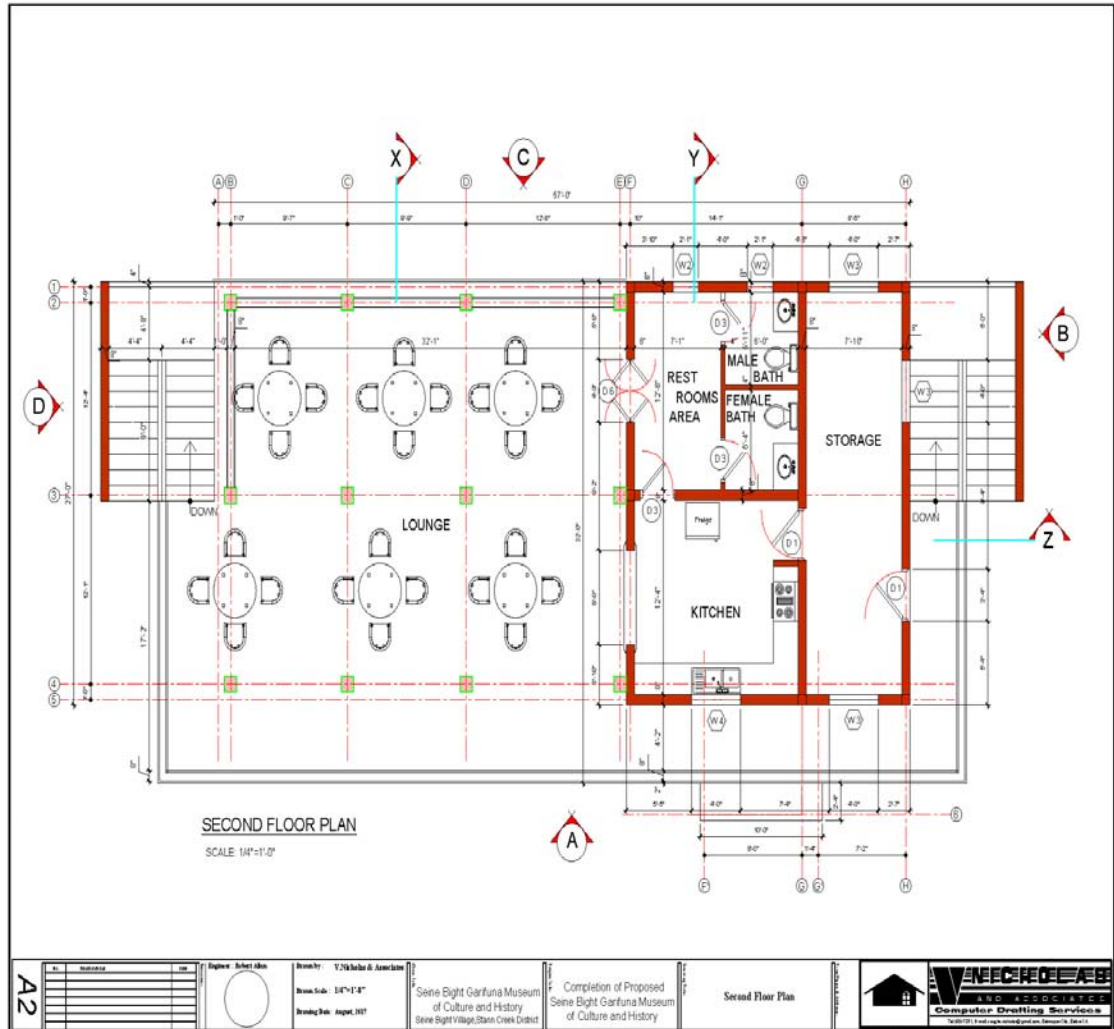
Museum Second Floor Plan (source: Architect, VNicholas and Associates)
